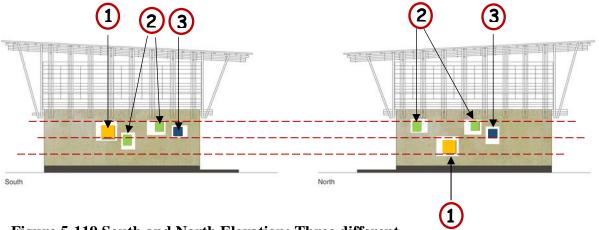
South and North Elevation: Three different sized windows are randomly arranged (ArchDaily, 2010)
